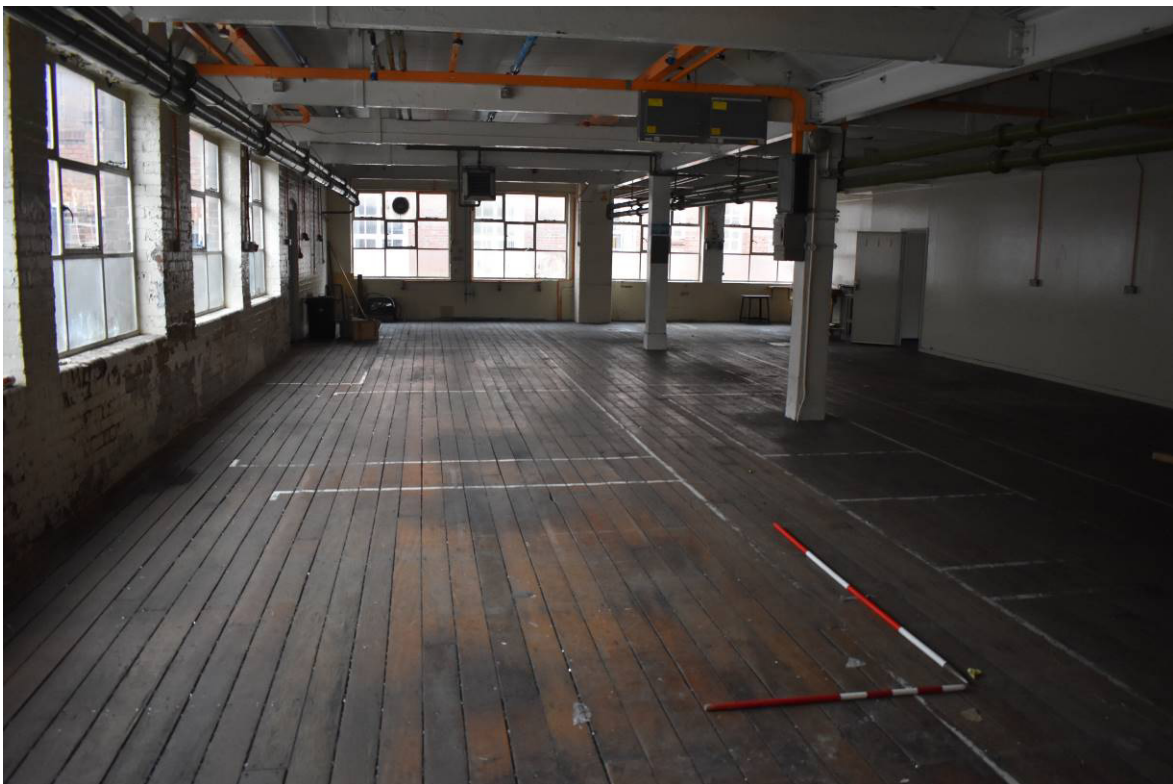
Block B, first floor Bay 2/3 looking east (NB. annotated as 'factory' on original design drawings).
